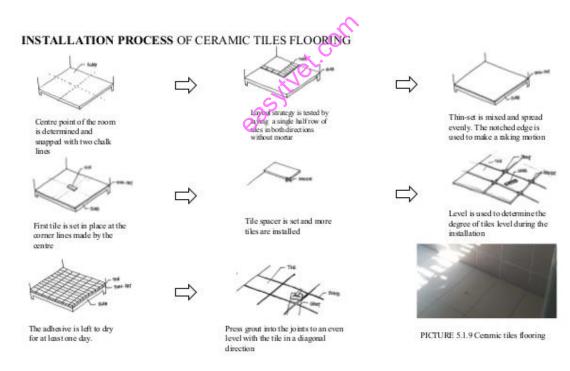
Installation process of ceramic tiles flooring Source; <u>https://image.slidesharecdn.com/buildingconstructioniireport-</u> 160714013425/95/building-construction-ii-report-47-638.jpg?cb=1468460102
